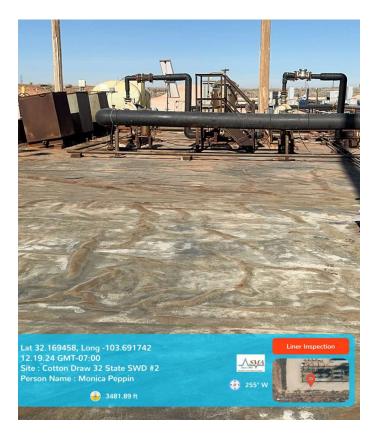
Looking south viewing liner under pump and equipment west of tanks.
